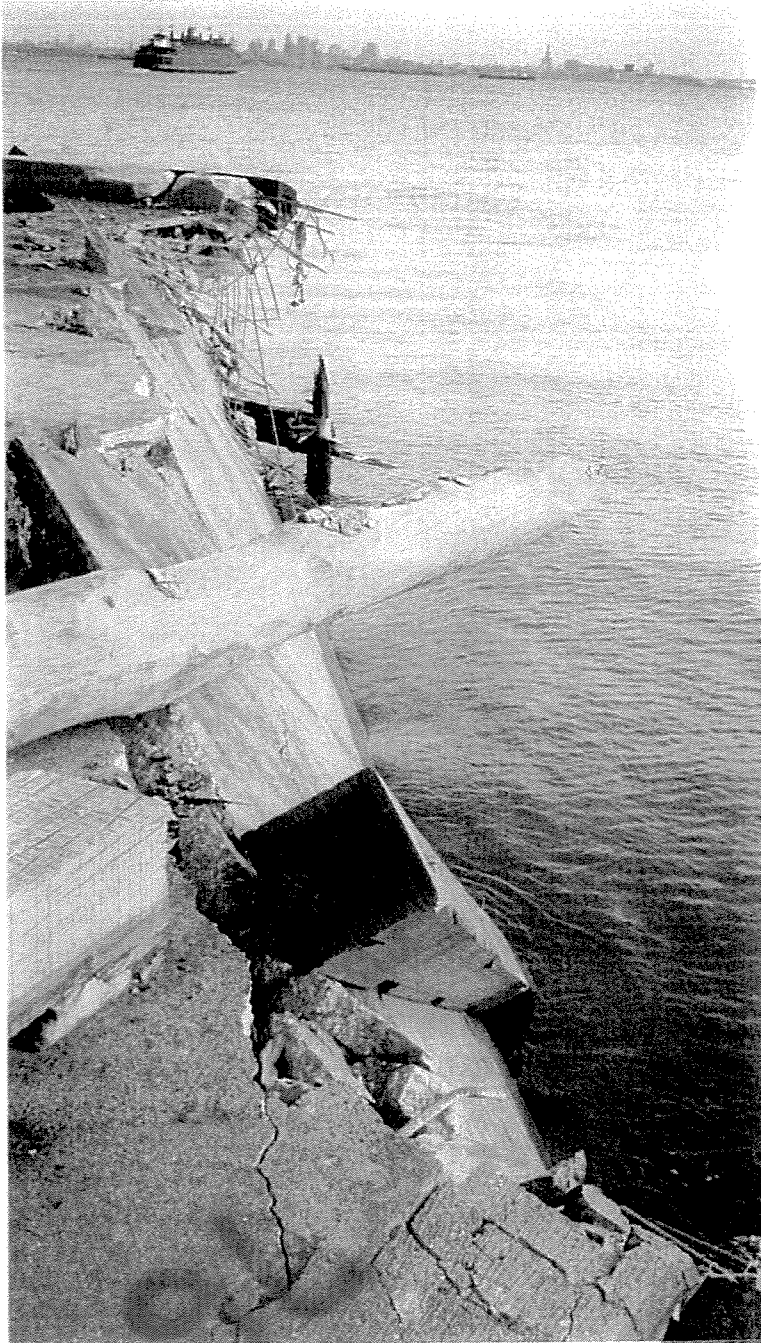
Top side view of collapsed SE corner of the pier looking NE.
